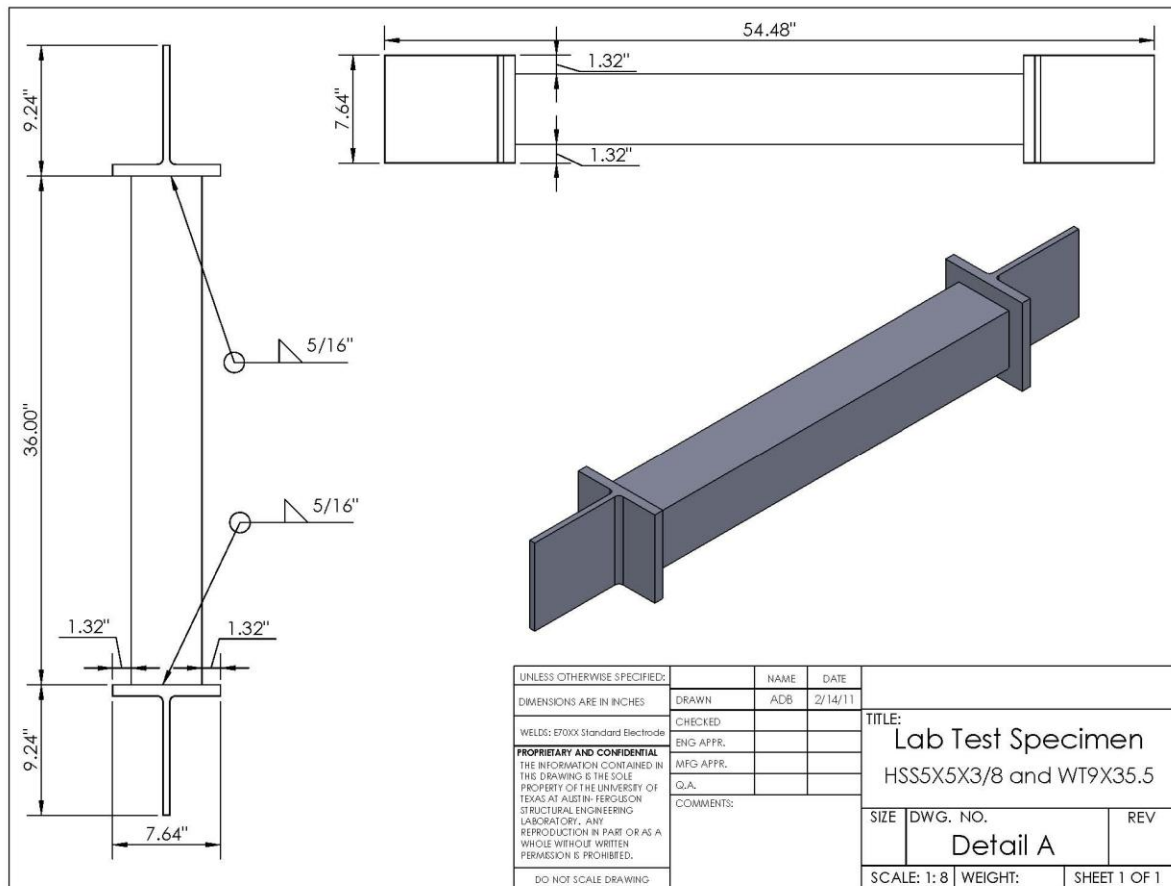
Square HSS Specimen with T-Stem Connection Detail
